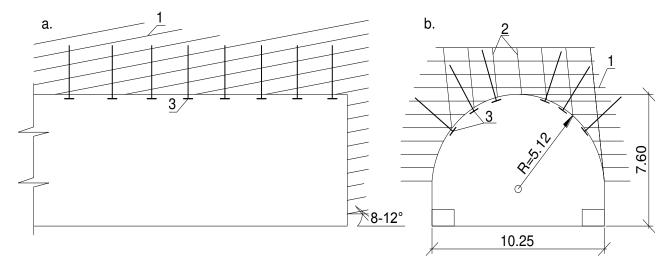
Anchoring of tunnels and galleries excavations at U.H.Cirskeik: a-long section, b-cross-section, 1-direction of schist plans, 2-tectonic faults, 3-anchors.
